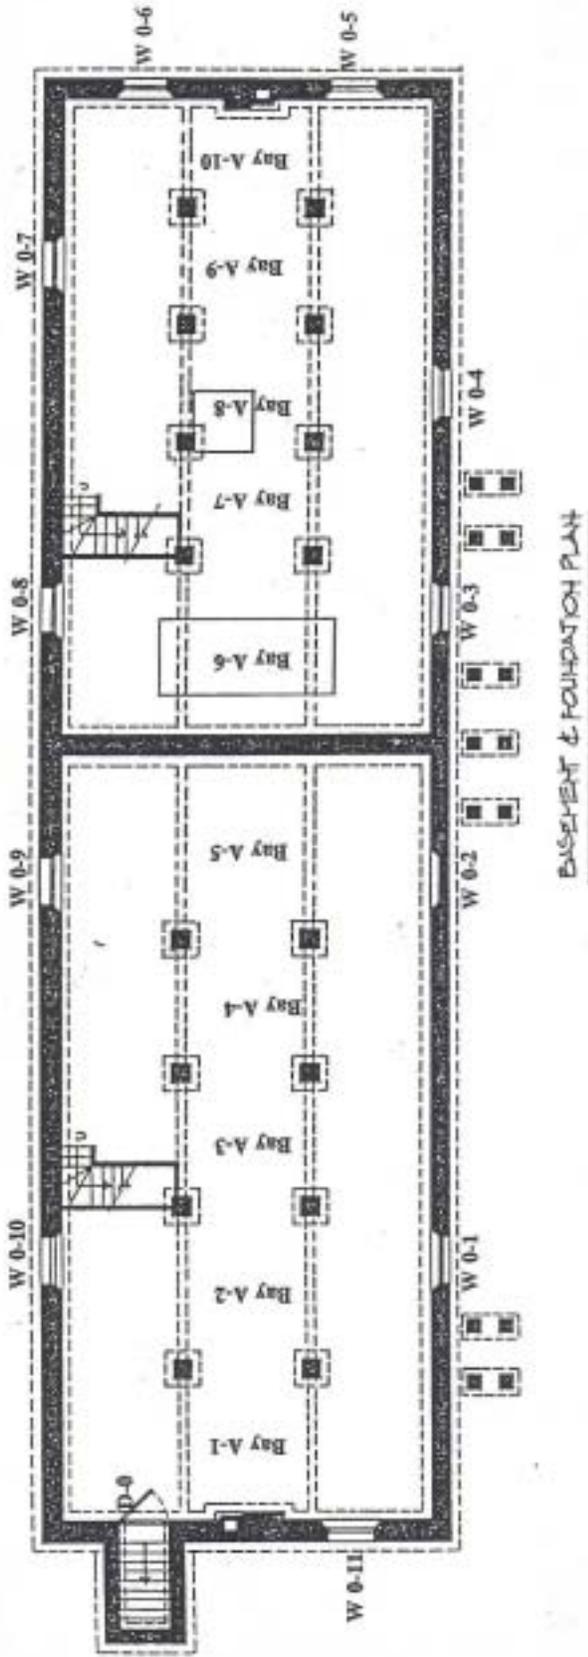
Basement plan of Building 32, showing scheduled rooms and openings. [1988- 1989].
